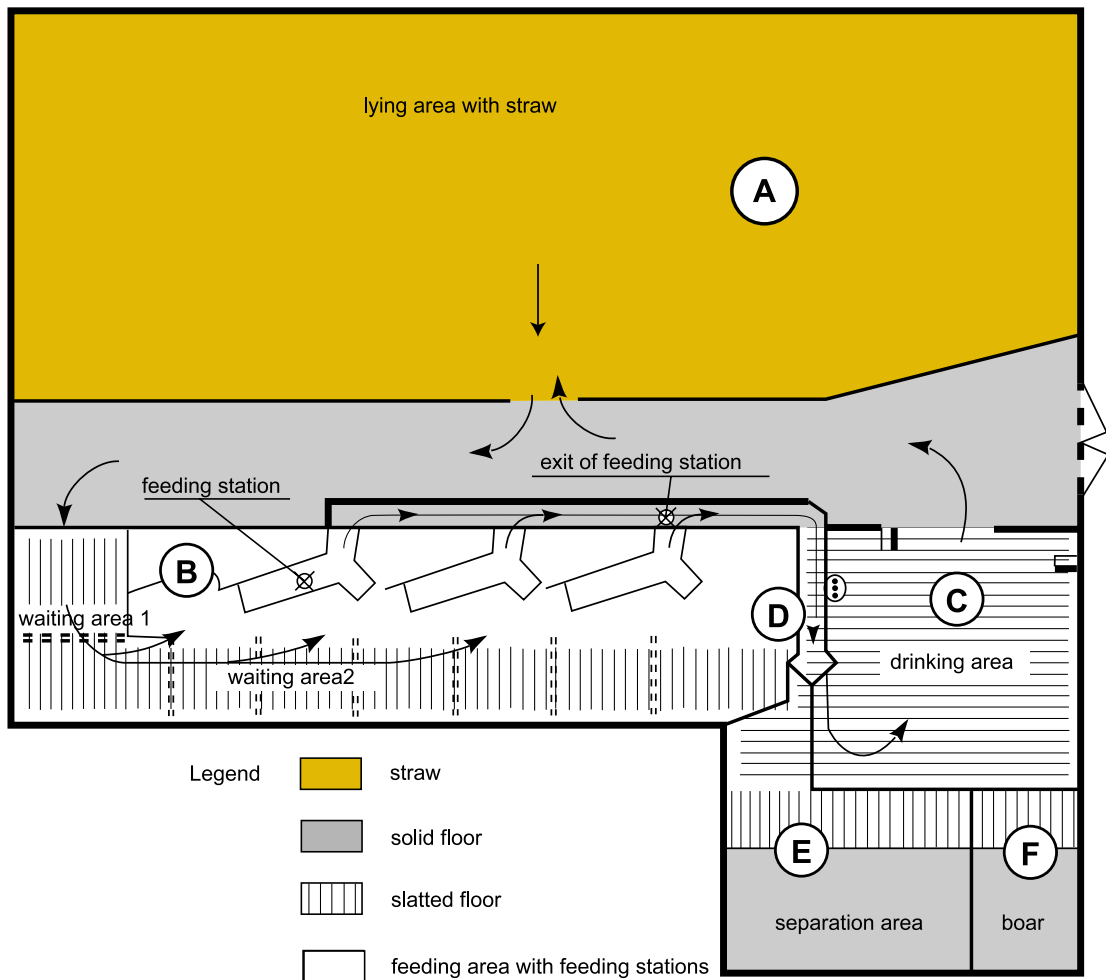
Plan view of the layout of the so-called 'walking around house for pregnant sows with feeding stations and straw bed' (adapted from Groenestein, 2000).
